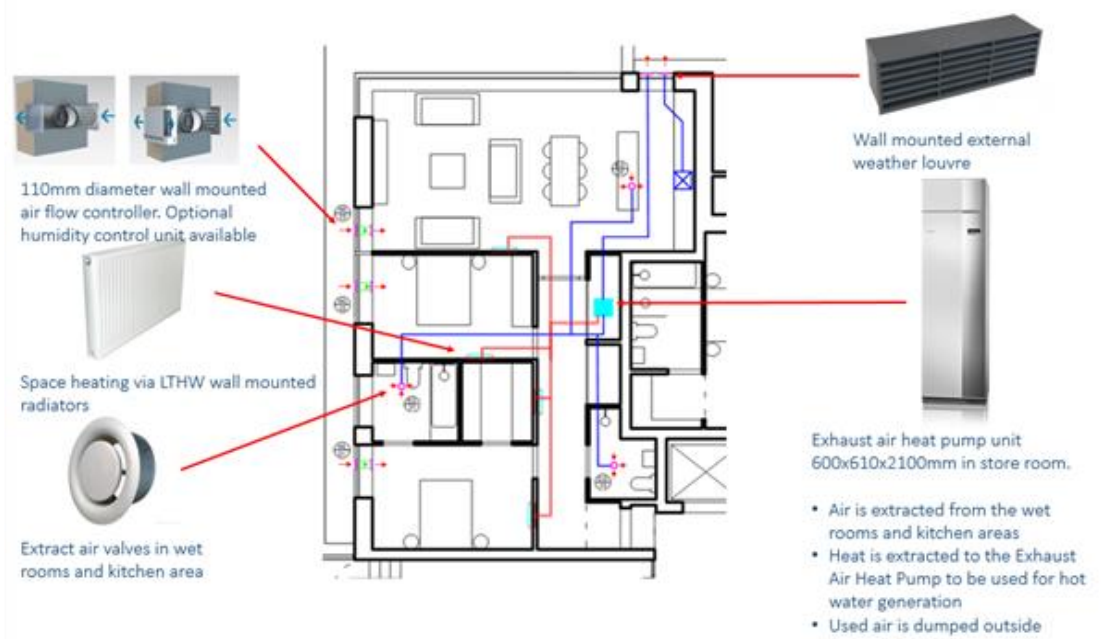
Example Diagram of Typical Exhaust Air Heat Pump Layout
